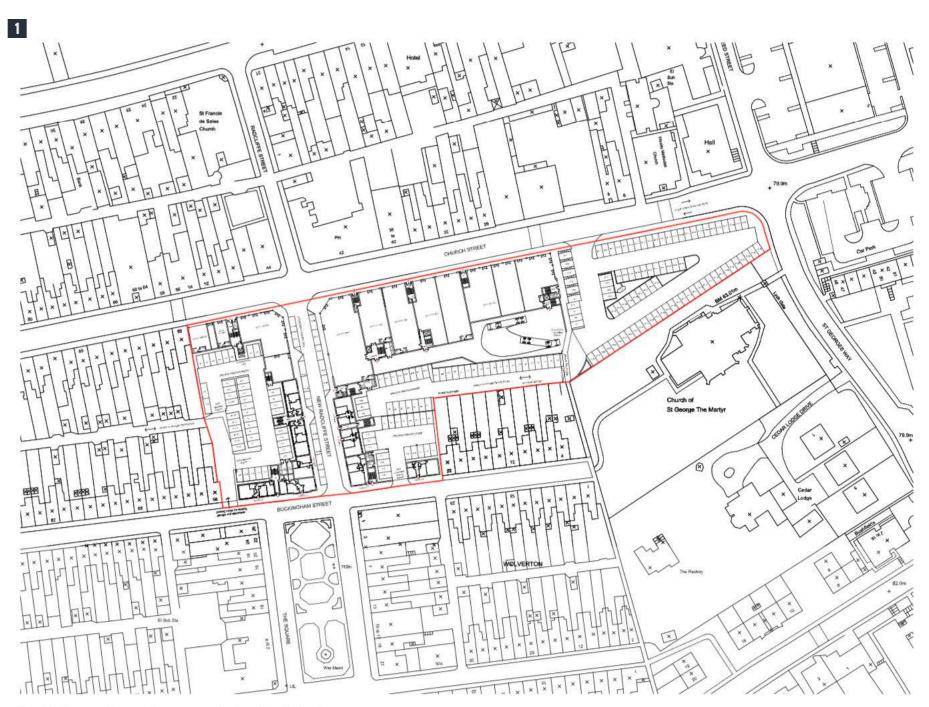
Proposed masterplan- not to scale [working drawing]
